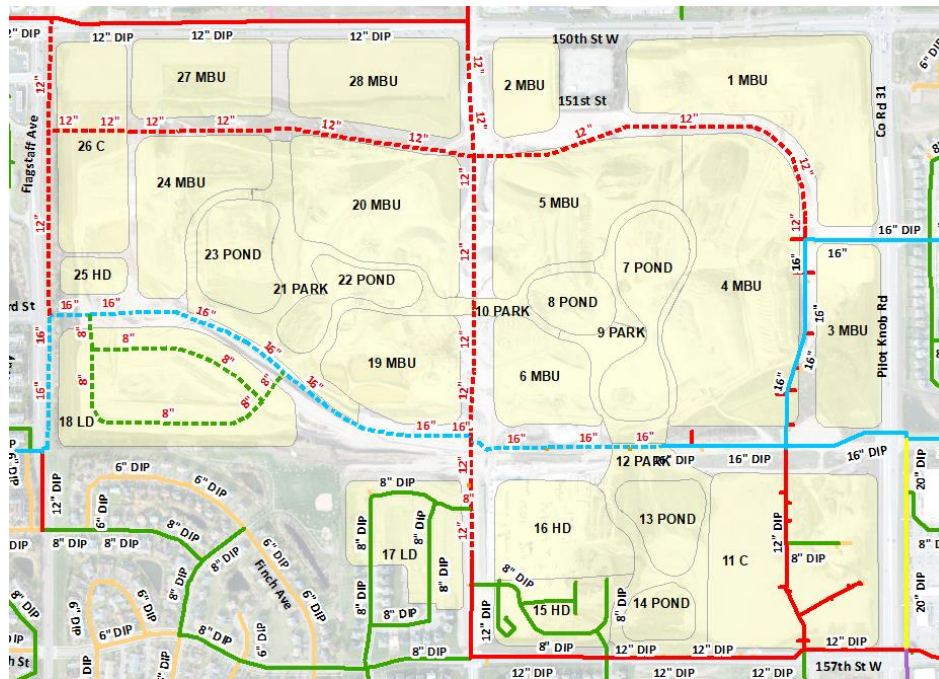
Layout of Scenario 1 – Comprehensive Plan - 2040
